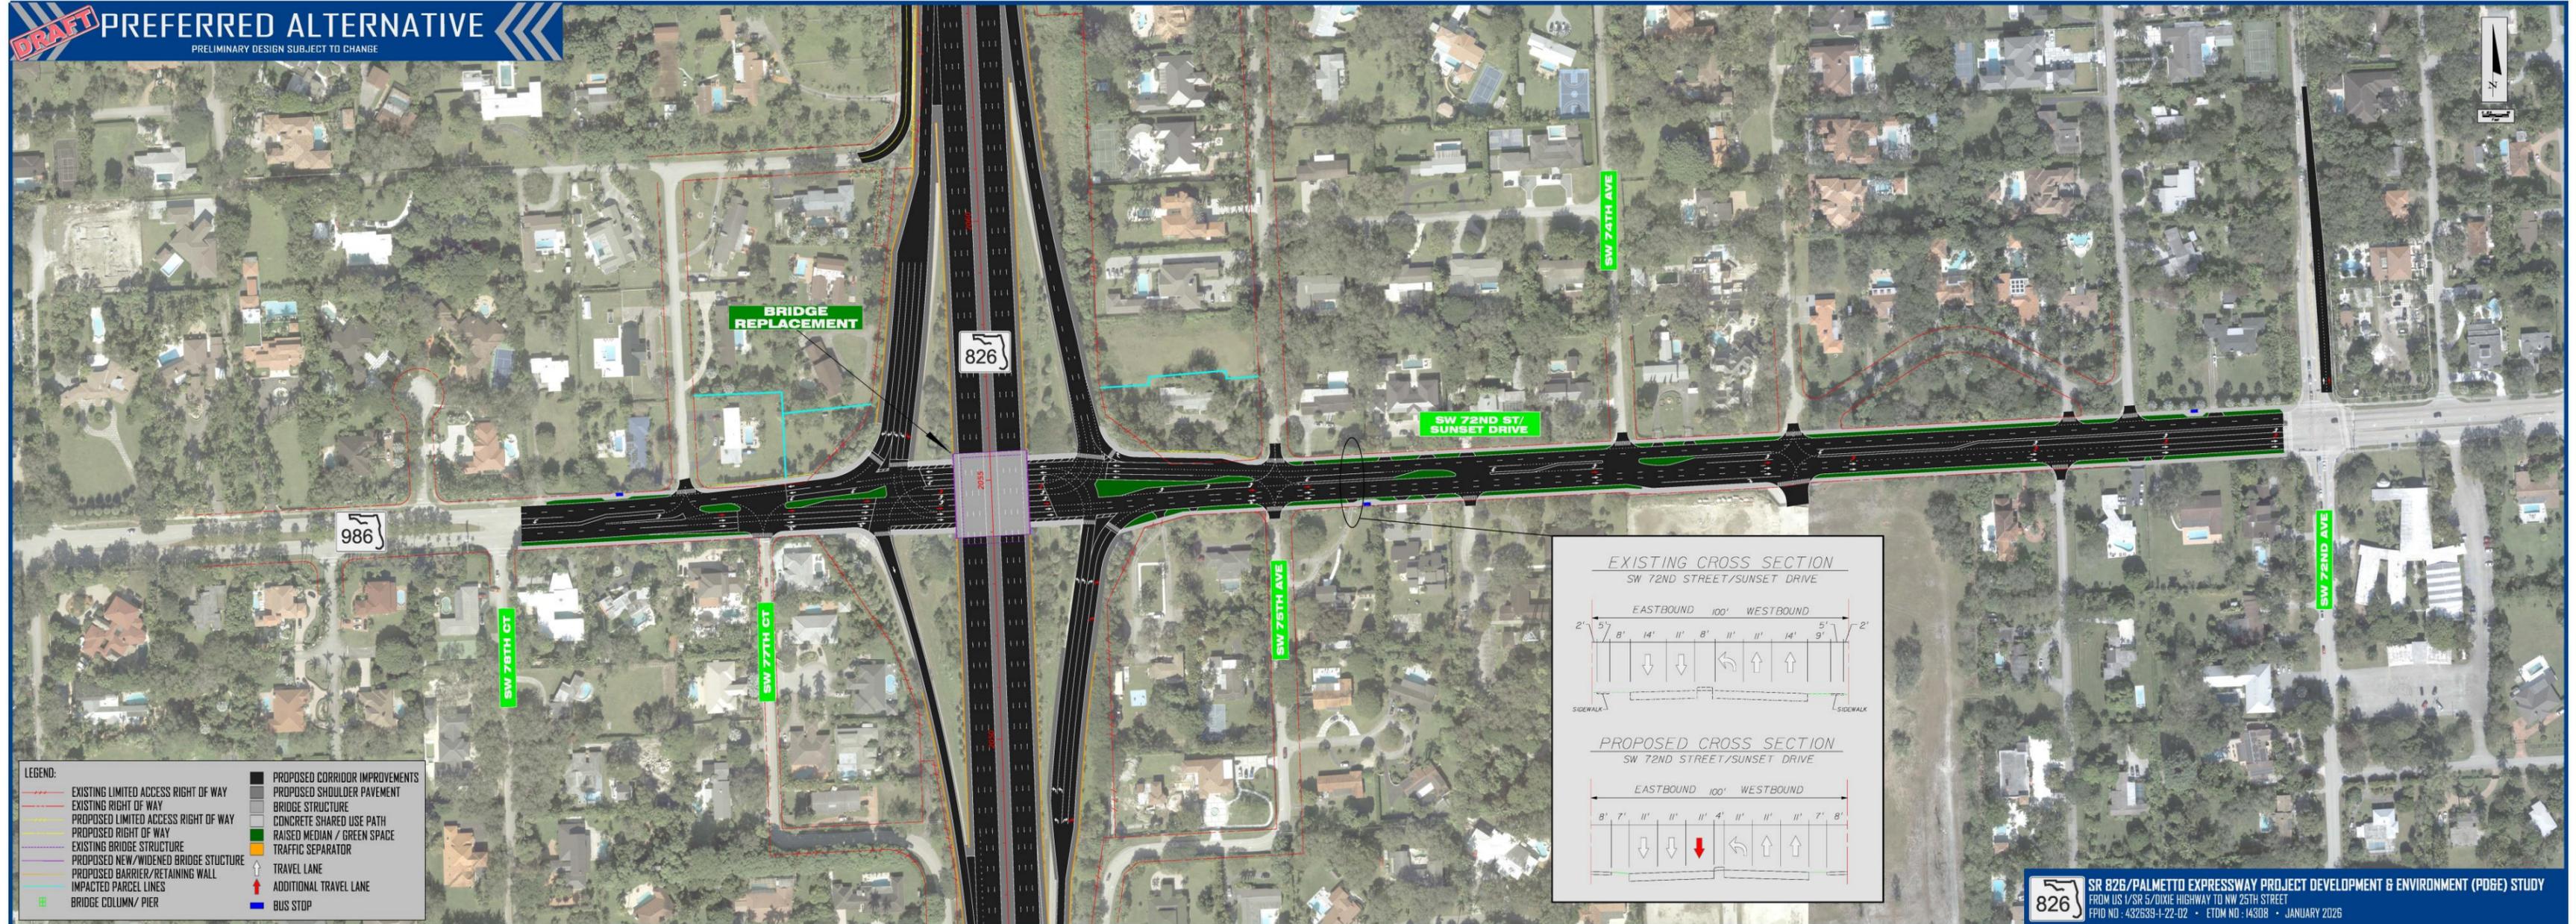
4: Proposed Sunset Drive Improvements – Concept Plan
